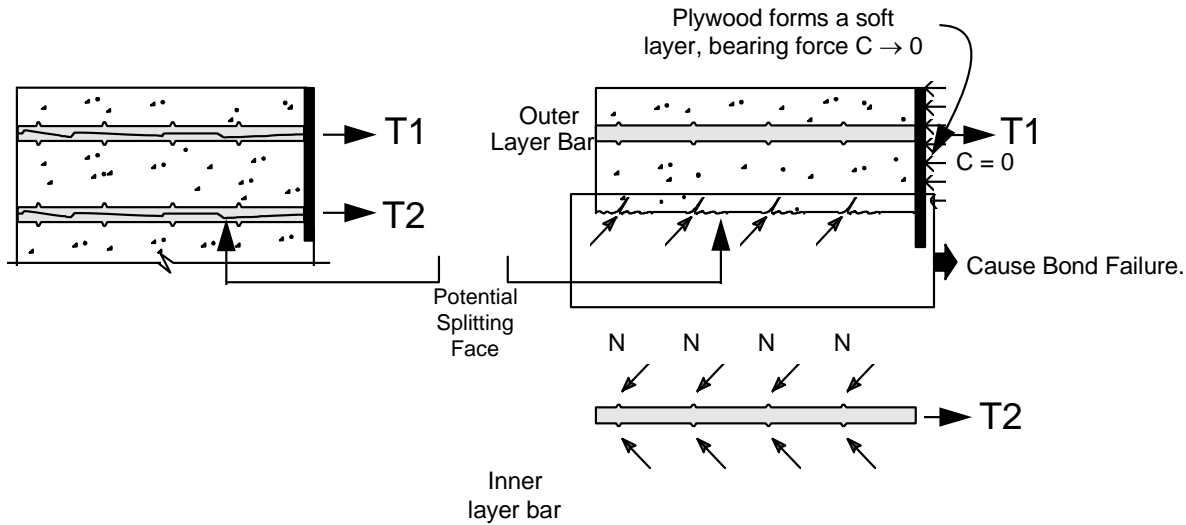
Bond failure mechanism of test region (Specimen #1). Plywood was used as separating material.
